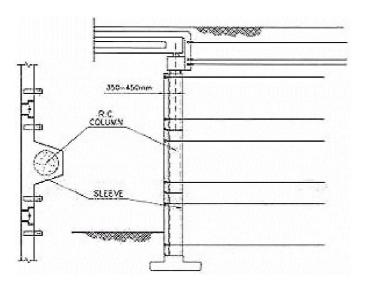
Integrated Abutment Facing developed by Terra Armada.
